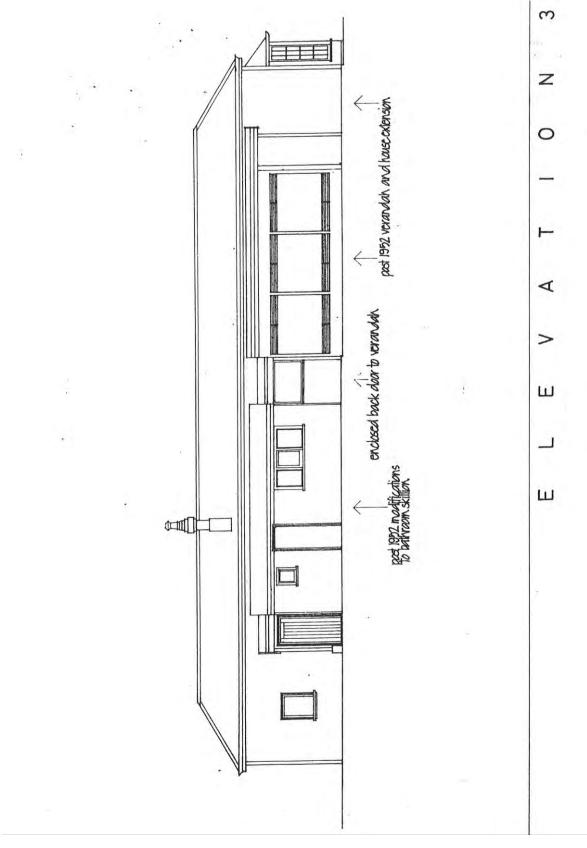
Northern (rear) elevation of Constable's Cottage, showing changes to the fabric. (Source: Gojak, D, c1985, Site Notes on South Head, courtesy of National Parks and Wildlife Service)
